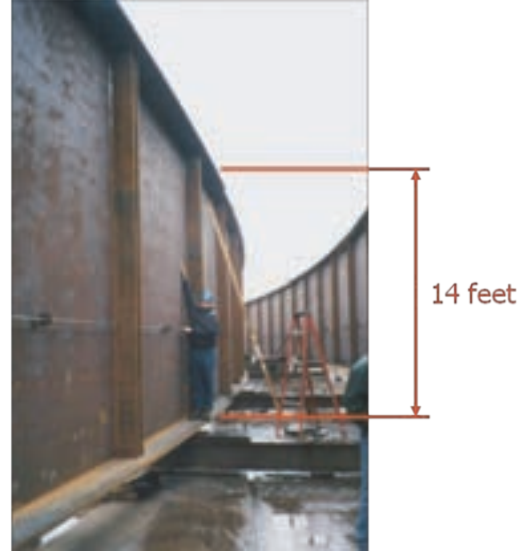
Ford City Bridge (EICCR11) girder depth and spacing (Chavel, 2008).
